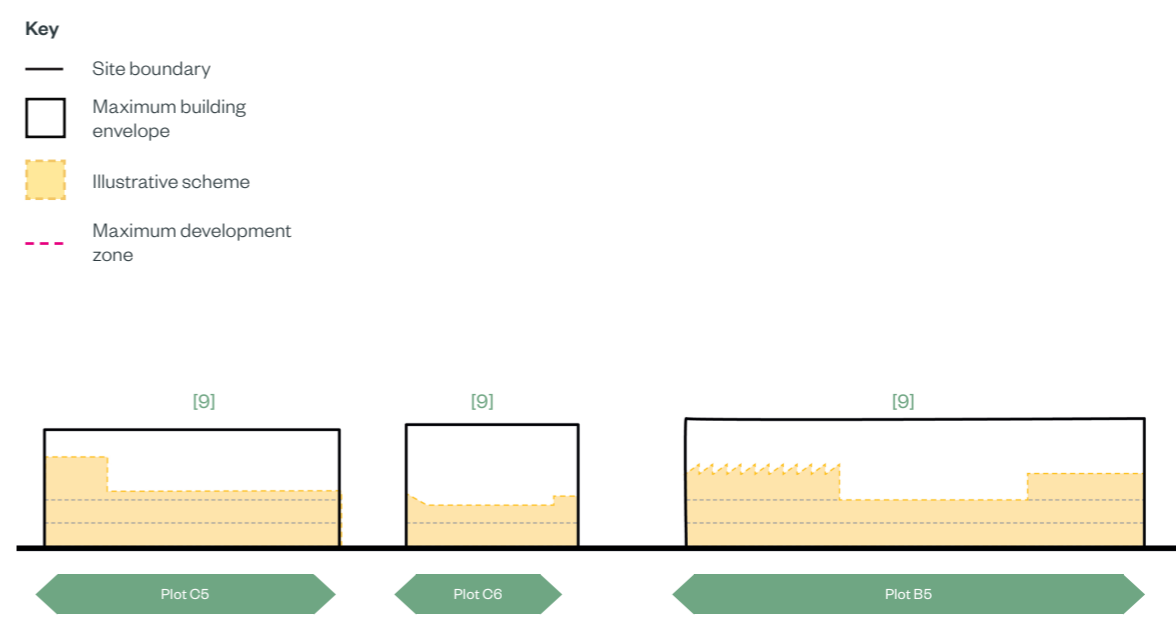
Illustrative elevation BB - Enterprise Yard looking west
